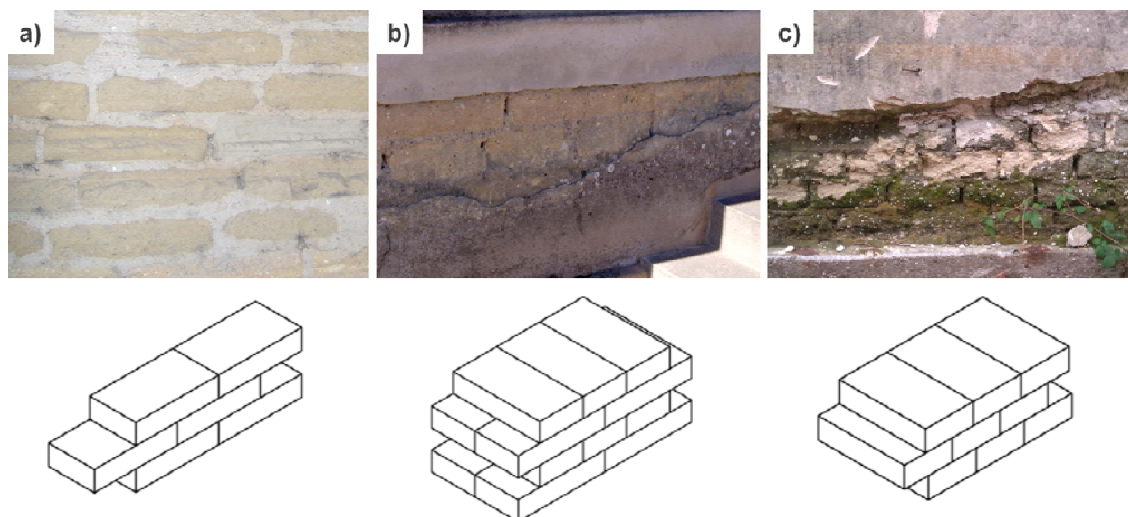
Types of adobe masonry bond: a) stretcher bond; b) English bond; c) header bond.
